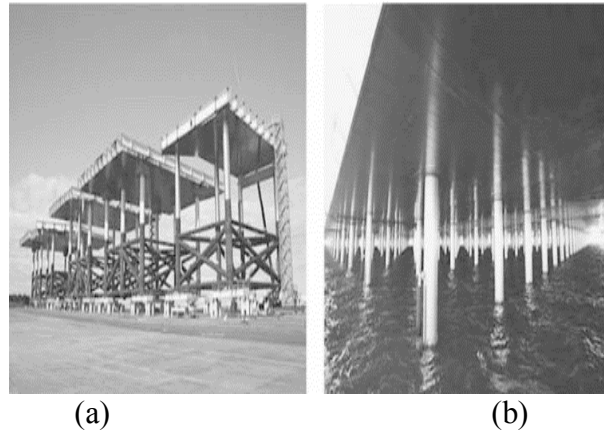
(a) Stainless Steel Jackets (b) UHPC element details. (Fehling et al.).
